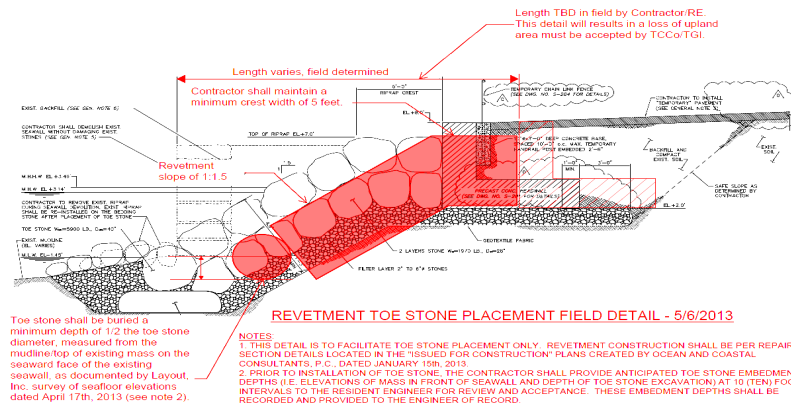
(above), section depicting the new revetment design (red) superimposed over the original contract design: Demolition of existing toe-stone is not needed, and excavation for and placement of a new toe-stone occurred at a higher ground, avoiding the need for cofferdams and reducing the potential for turbidity in the water due to construction activity.
